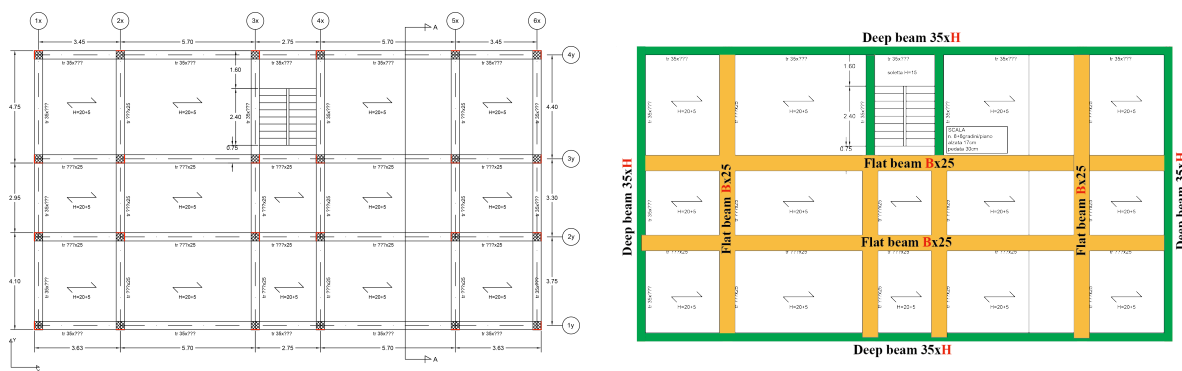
a) floor plan with fixed reference grid and one way slab orientation
